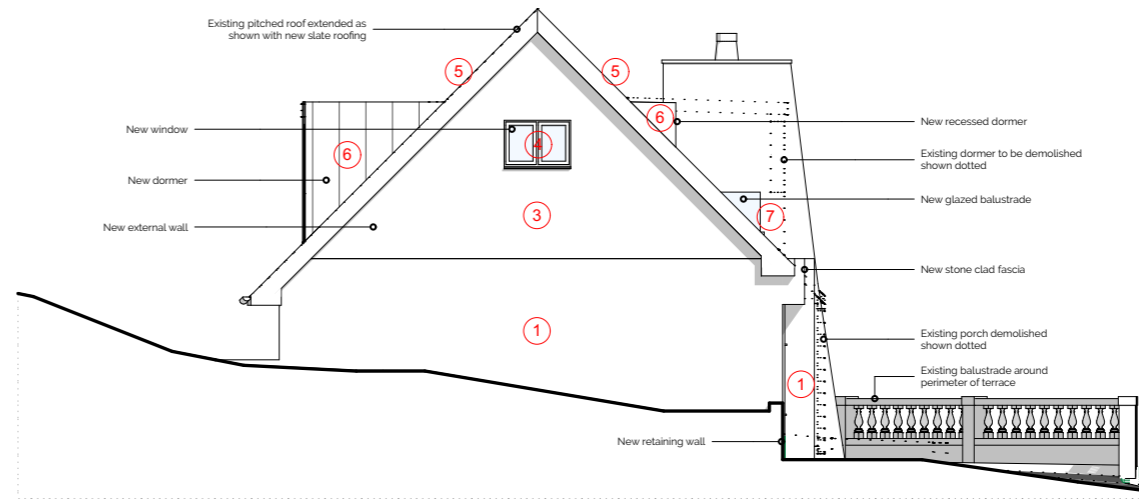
71 Leeson Road Proposed West Elevation - Not to Scale
